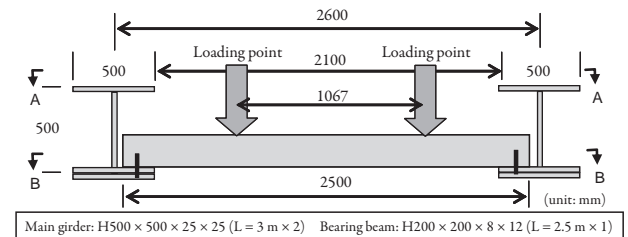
Specimen for Bearing Beam Static Loading Tests (cross section)
